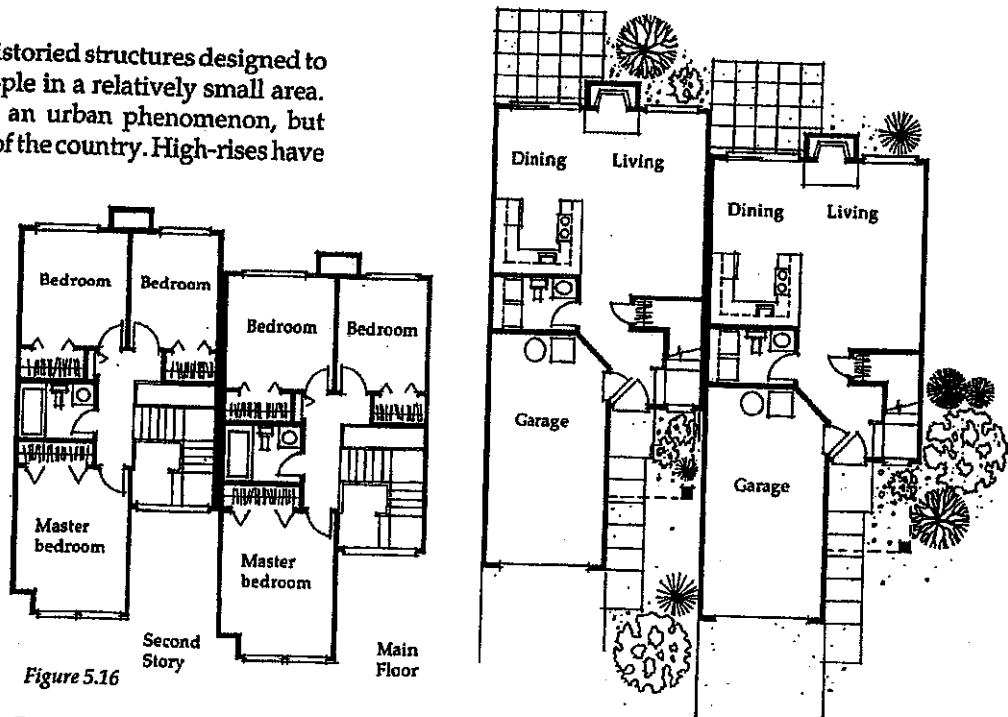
A two-story town house, typically used for condominiums or apartments. The main floor houses an open floor plan with living room, dining area, and kitchen, plus a laundry/powder room combination and coat closet. Upstairs are three bedrooms around a common bath.
